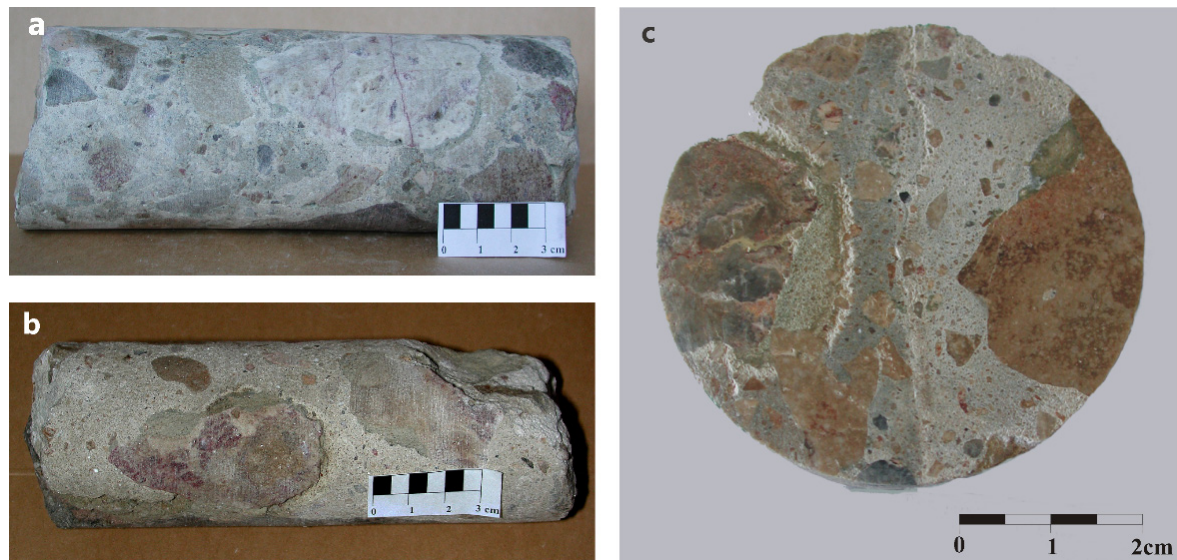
Fragments of cores from the Camarasa Dam. (a) Type A concrete; (b) type B concrete; (c) core section: the left half is made up of type B concrete and the right half is type A.
